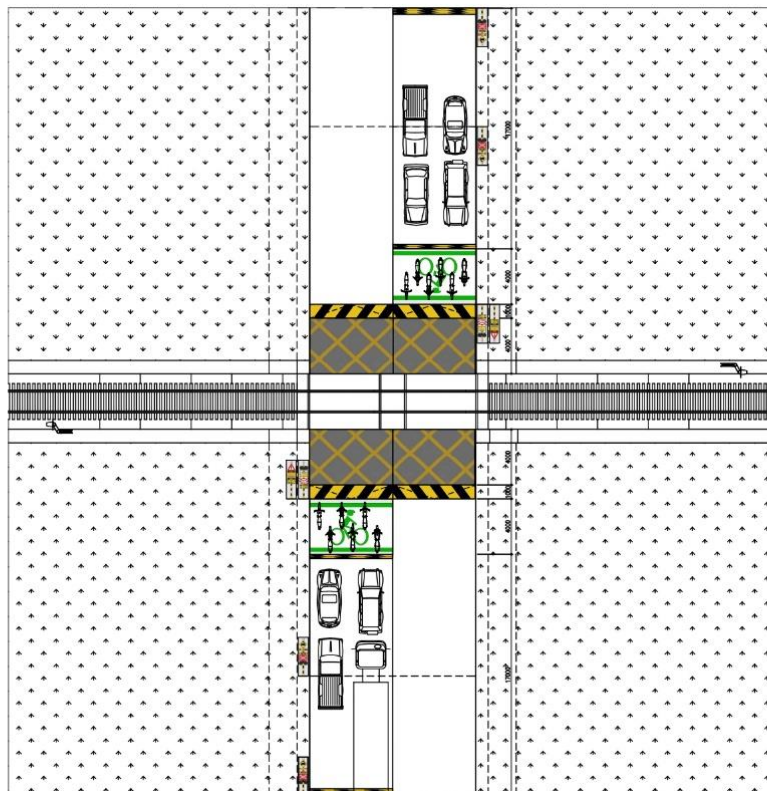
Proposed Layout Design of Rising-Barriers (Author, 2025).
